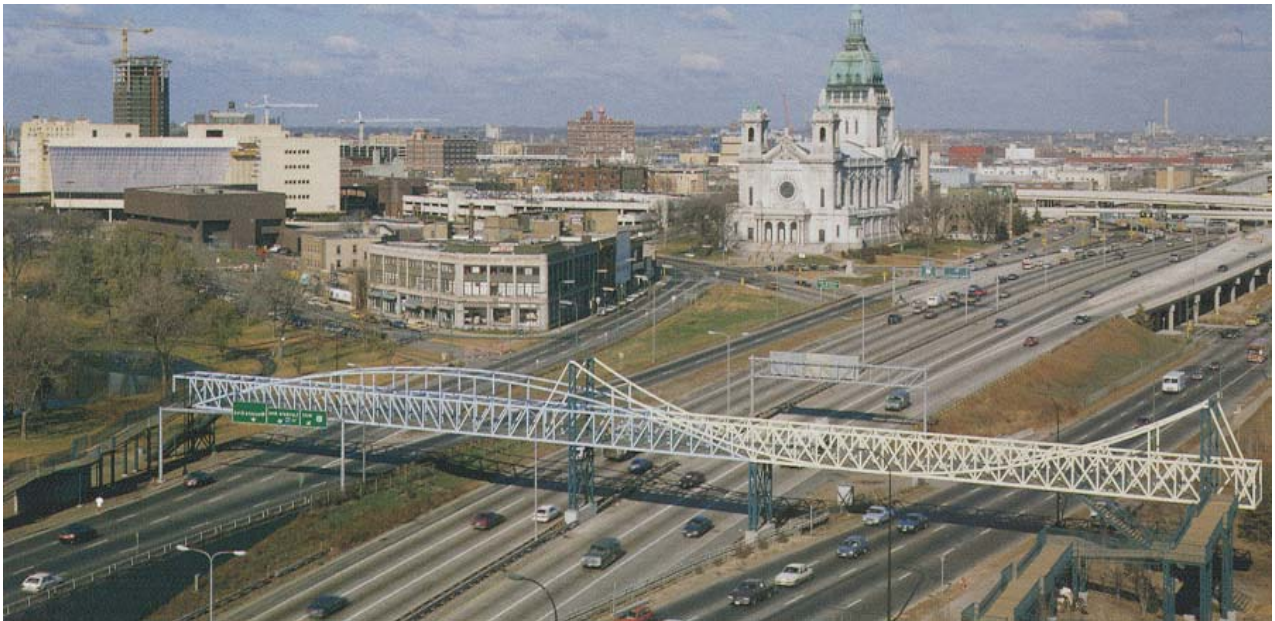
Existing Pedestrian Bridge: The existing pedestrian walkway at 16th Street NW lacks alluring appeal that encourages use.
